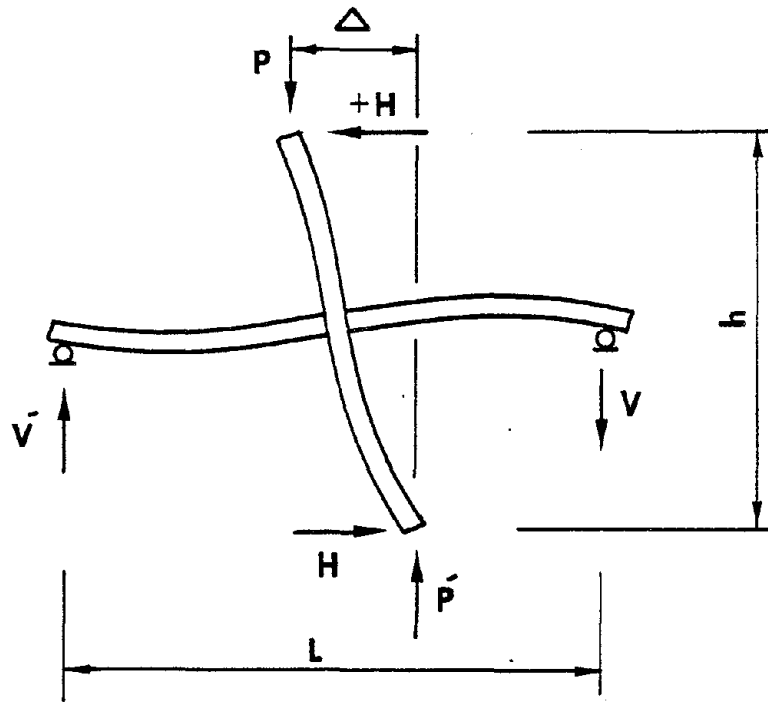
Deformed Shape of Beam-Column Subassemblage
